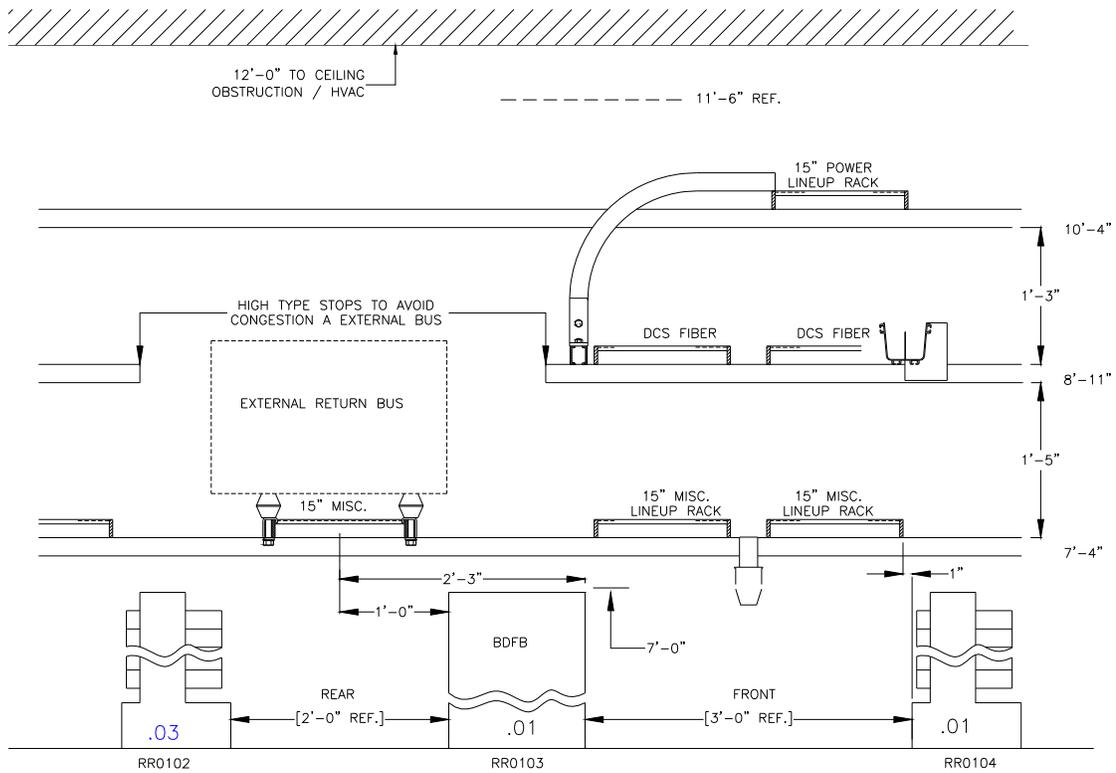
A – TYPICAL PLAN VIEW OF NEW AREA WITH 3-TIERED CABLE RACKING
